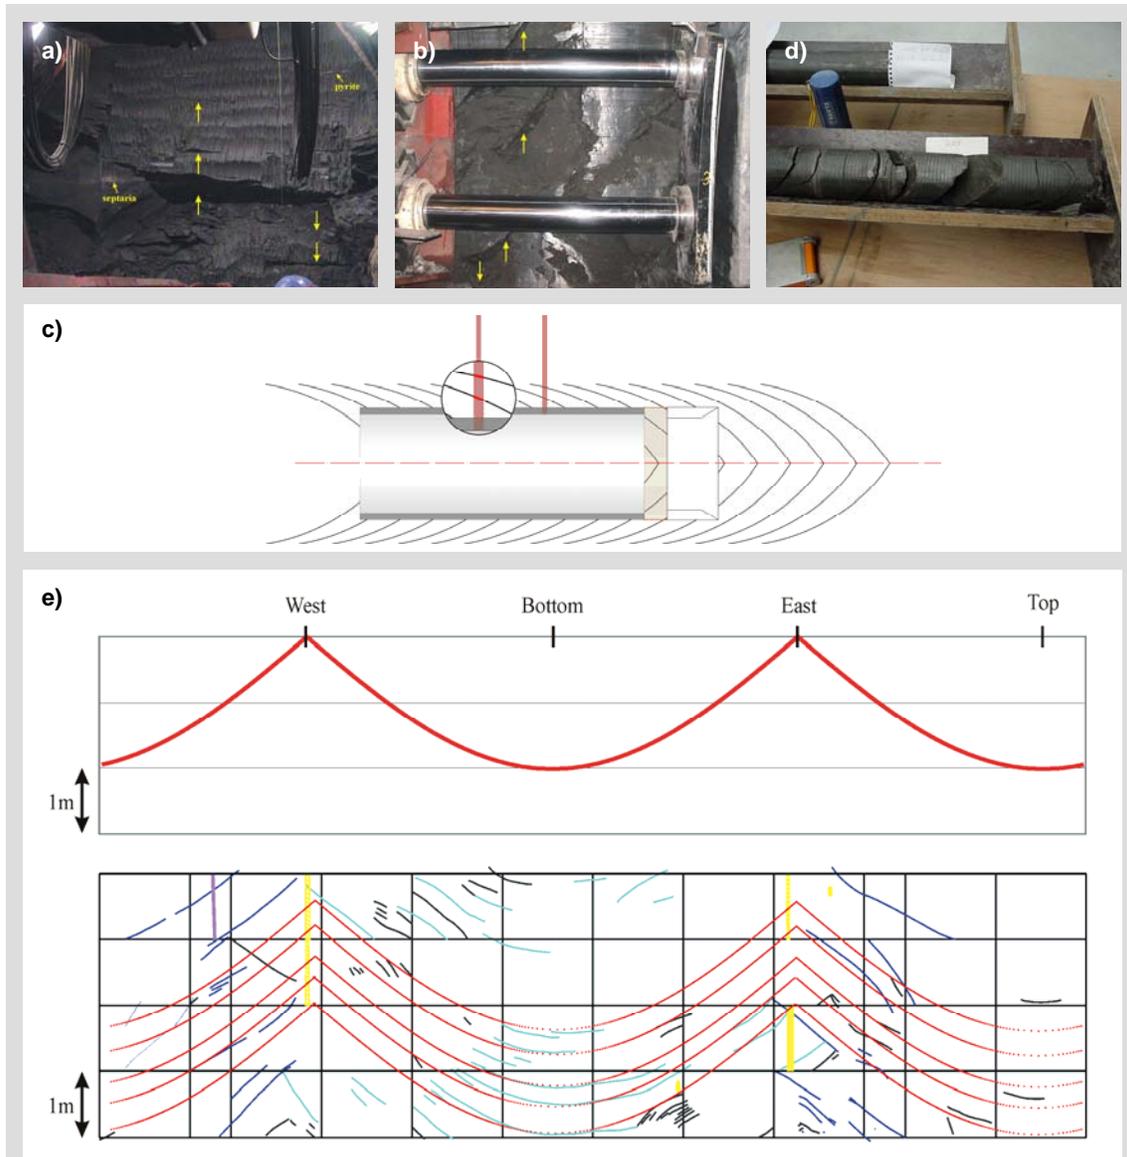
Fractures observed during the construction of the connecting gallery. a) Excavation front; b) Eastern sidewall, unsupported zone; c) Vertical cross section through the gallery showing the fracturation pattern around it, as deduced from the observations; d) Detail of a clay core obtained from a borehole drilled from the gallery (as shown on c); e) Theoretical traces on the excavated profile (represented as an unfolded cylinder) of a (slightly simplified) fracturation pattern and part of the fracture map (one band corresponds to 1 metre). The theoretical and observed traces are similar. Pyrite (purple) and septaria (yellow) layers are shown, too.
